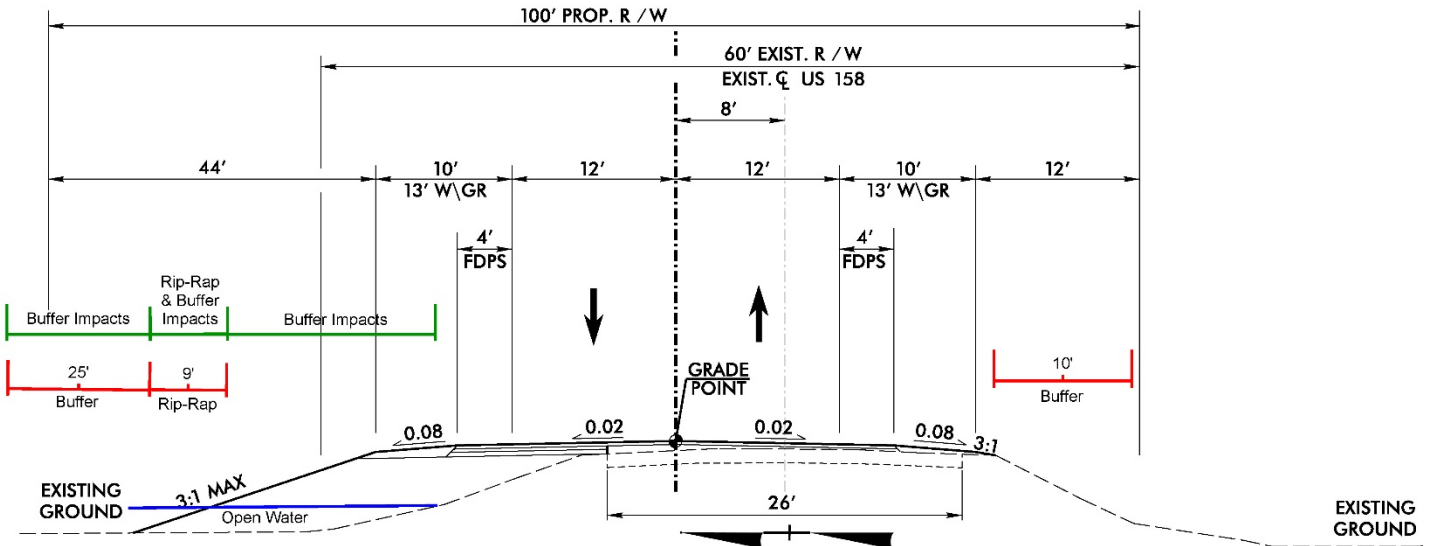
Alternative 2 Proposed Typical Section West of the Refuge
